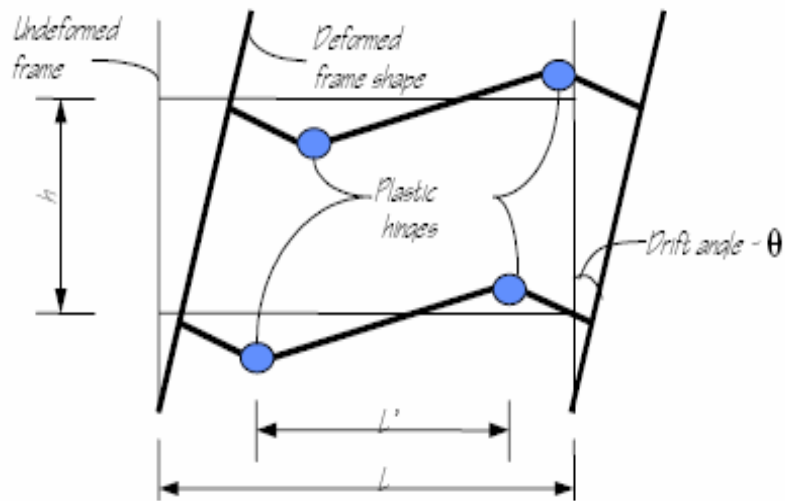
Inelastic Behavior of Frames with Hinges in Beam Span
